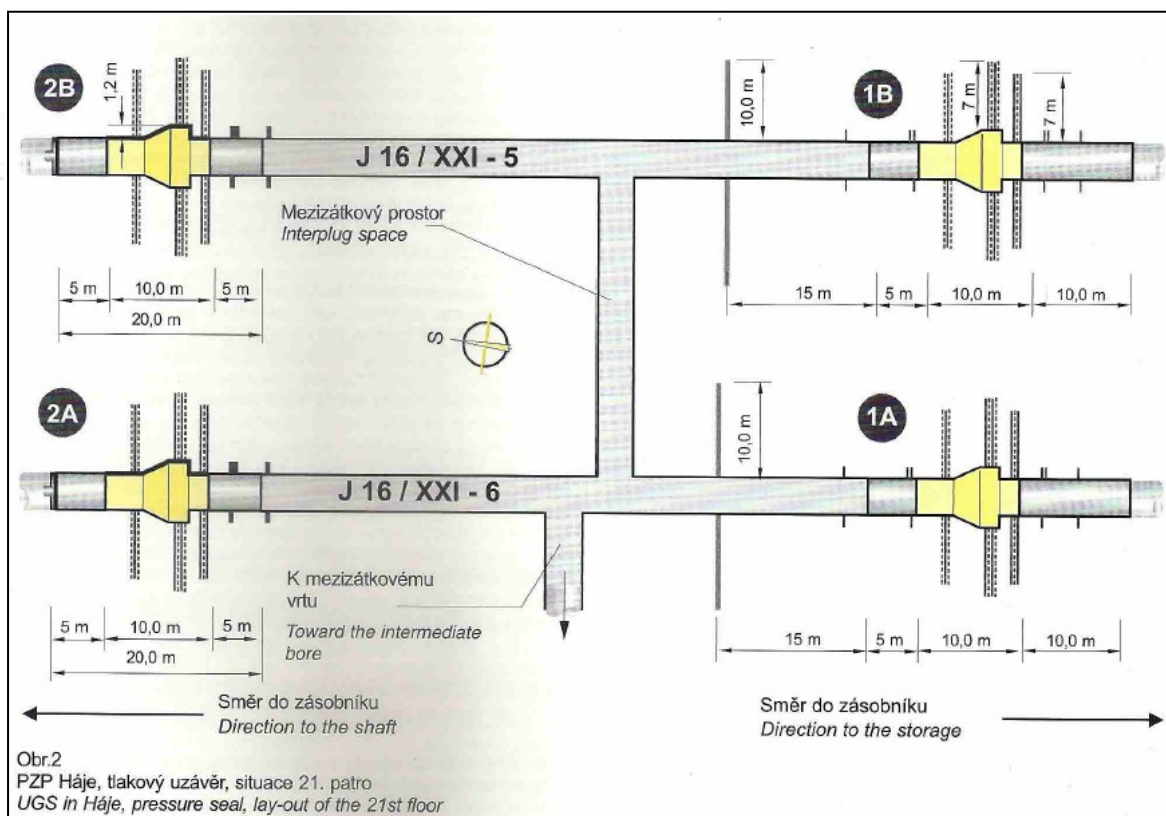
Layout of the concrete plugs used in the Háje underground gas storage facility (Cigler *et al.*, 1999).
